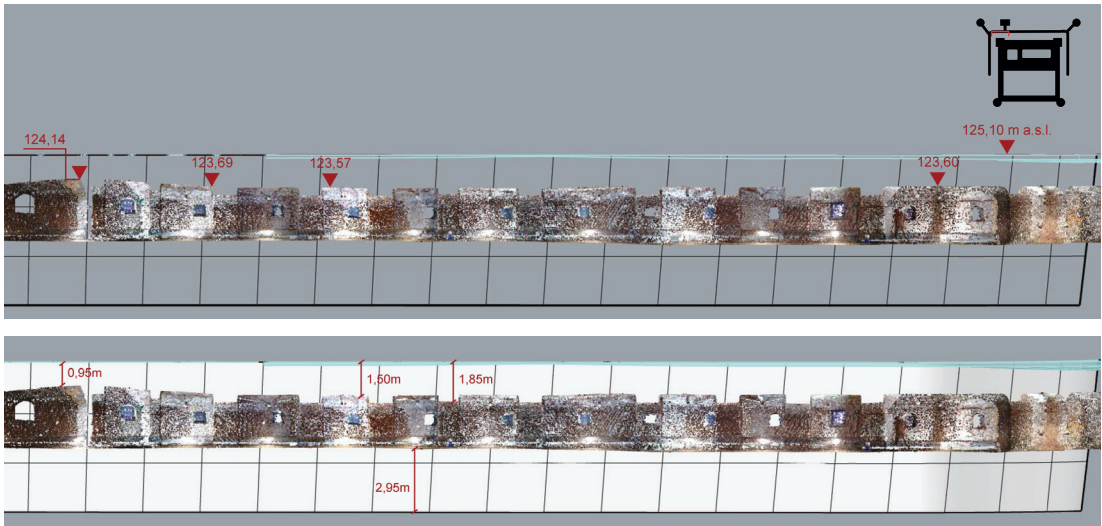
g Longitudinal sections of the counterscarp tunnel (point cloud and 3D model).
